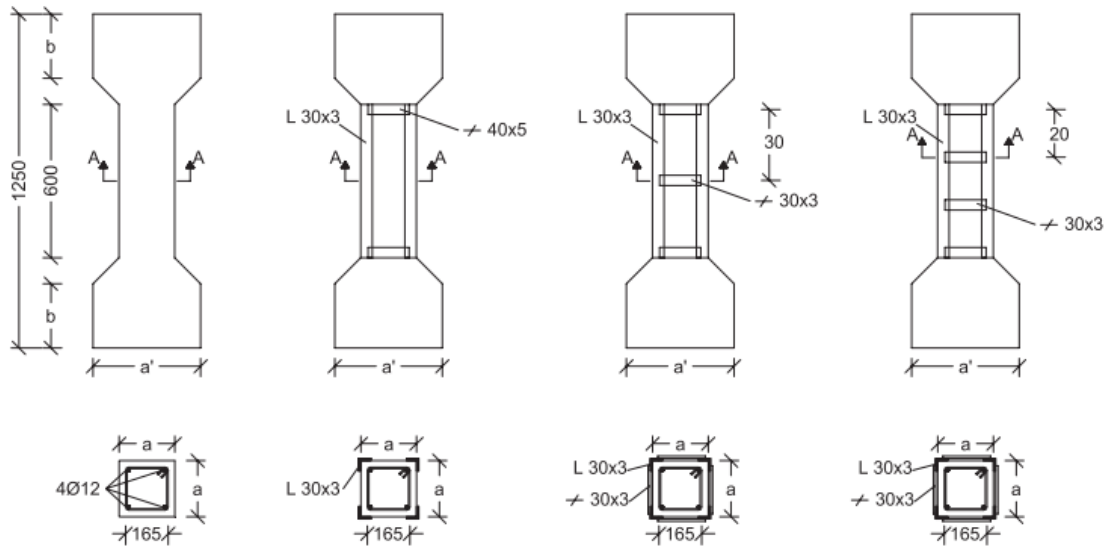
Strengthened specimens with steel angles and steel battens. Campione (2013)
